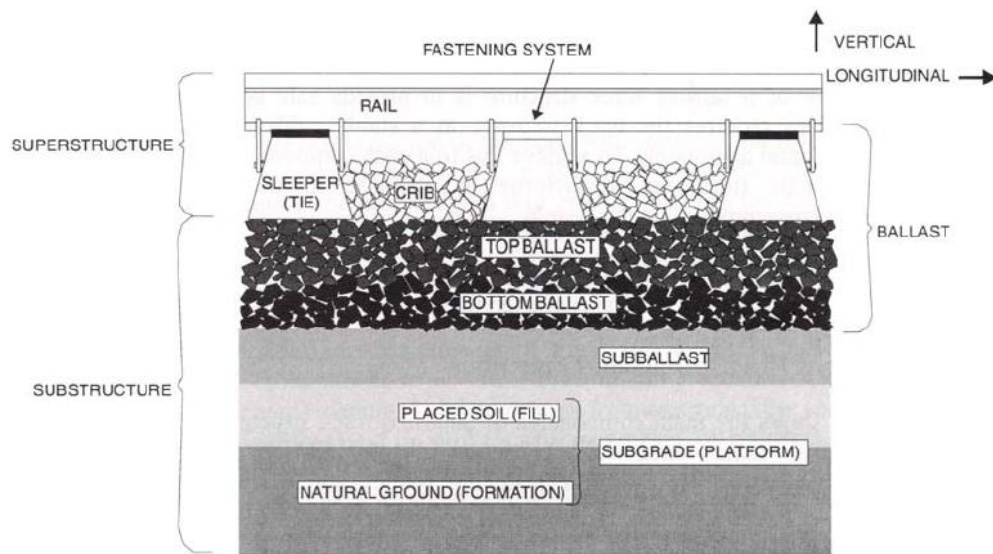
Track layout side view (Selig and Waters 1994)
